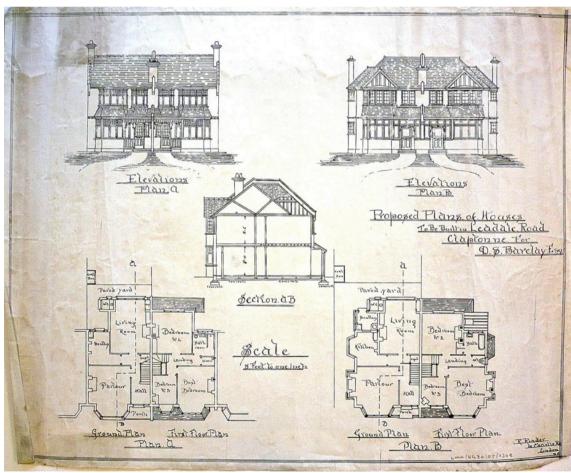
Houses in Leadale Road, Clapton, designed by Richard Reader as D.S. Barclay's builders' manager. The building notice was submitted as late as August 1914, but they were still built (Reader Brothers Collection, LMA/4430/05/030, London Metropolitan Archives).
